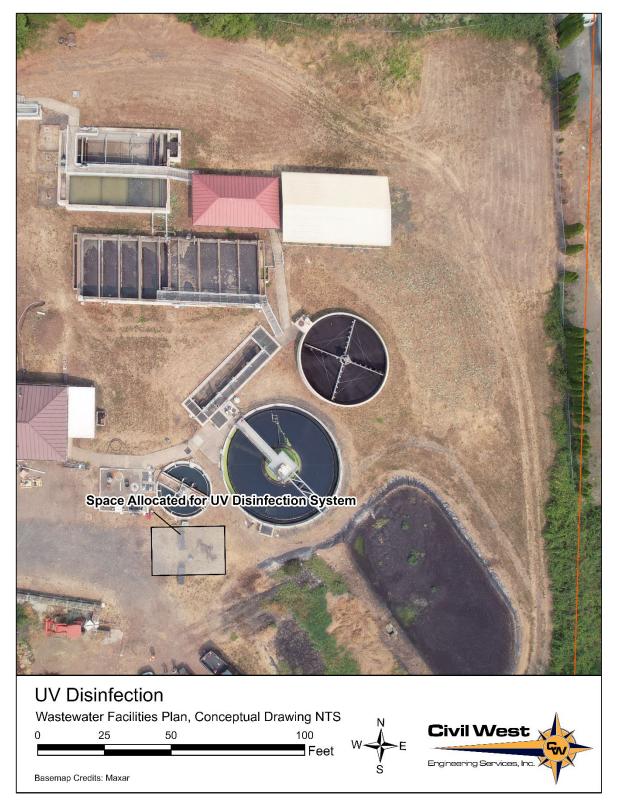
Conceptual Site Plan of UV Disinfection Alternative
